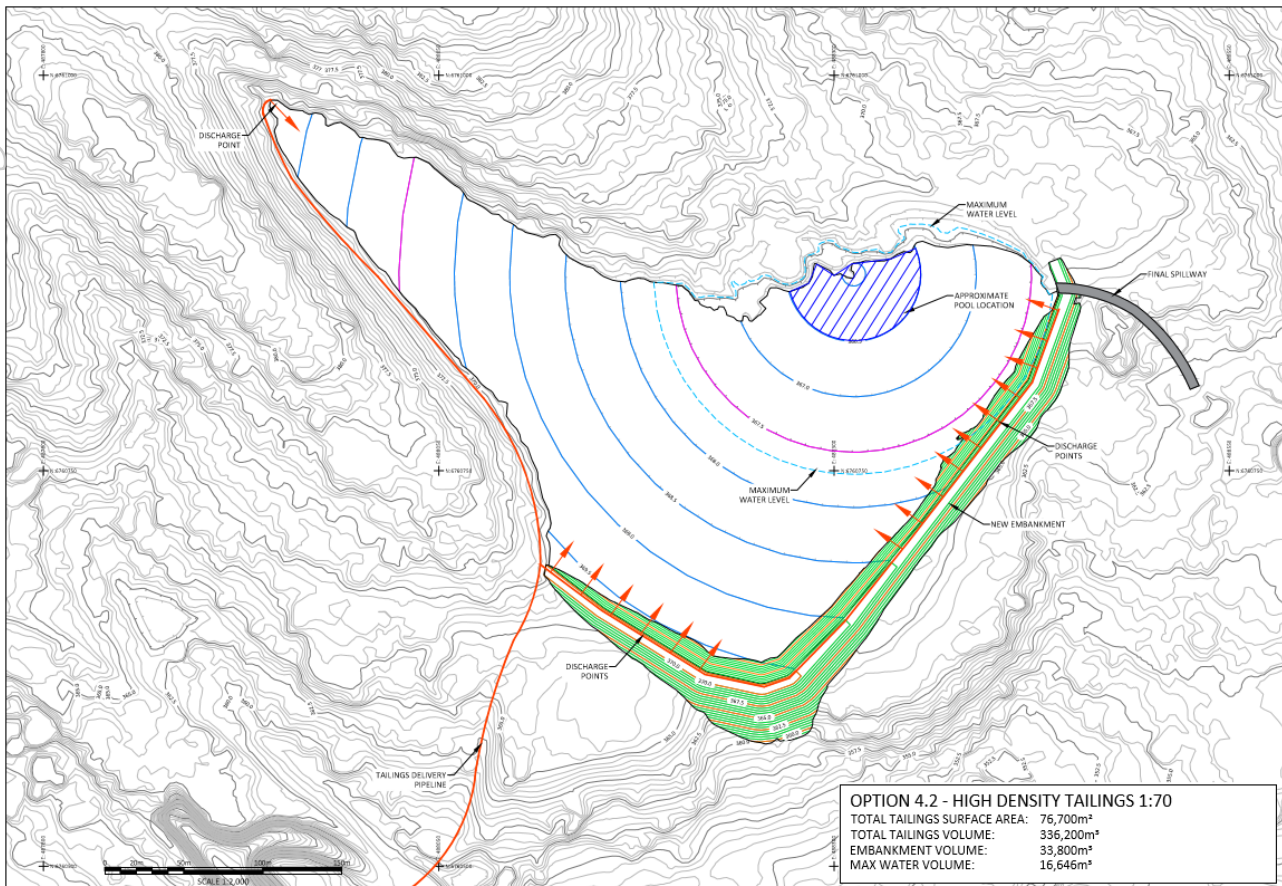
TAILINGS STORAGE FACILITY CONCEPT DRAWING
